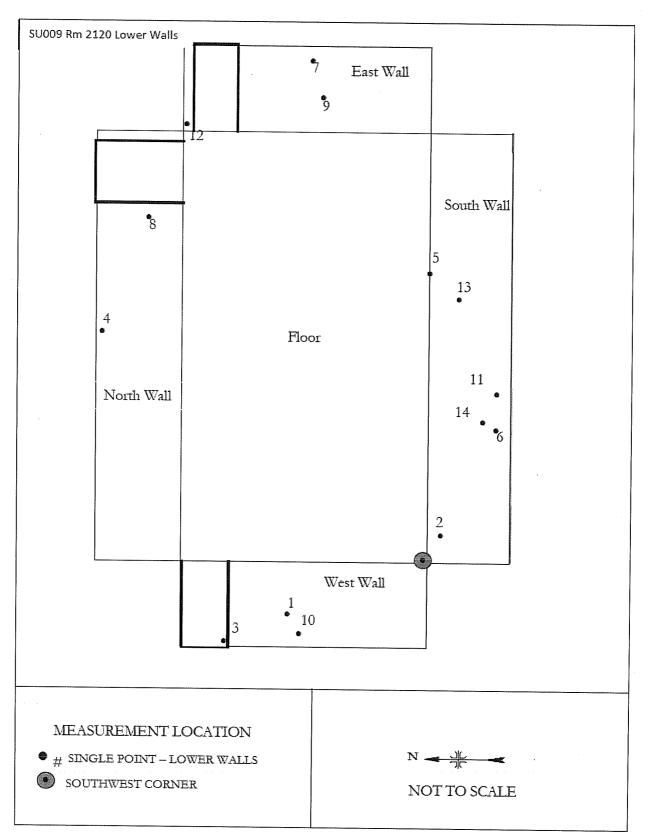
Survey Unit 009, Room 2120 Lower Walls - Direct Measurement Locations
